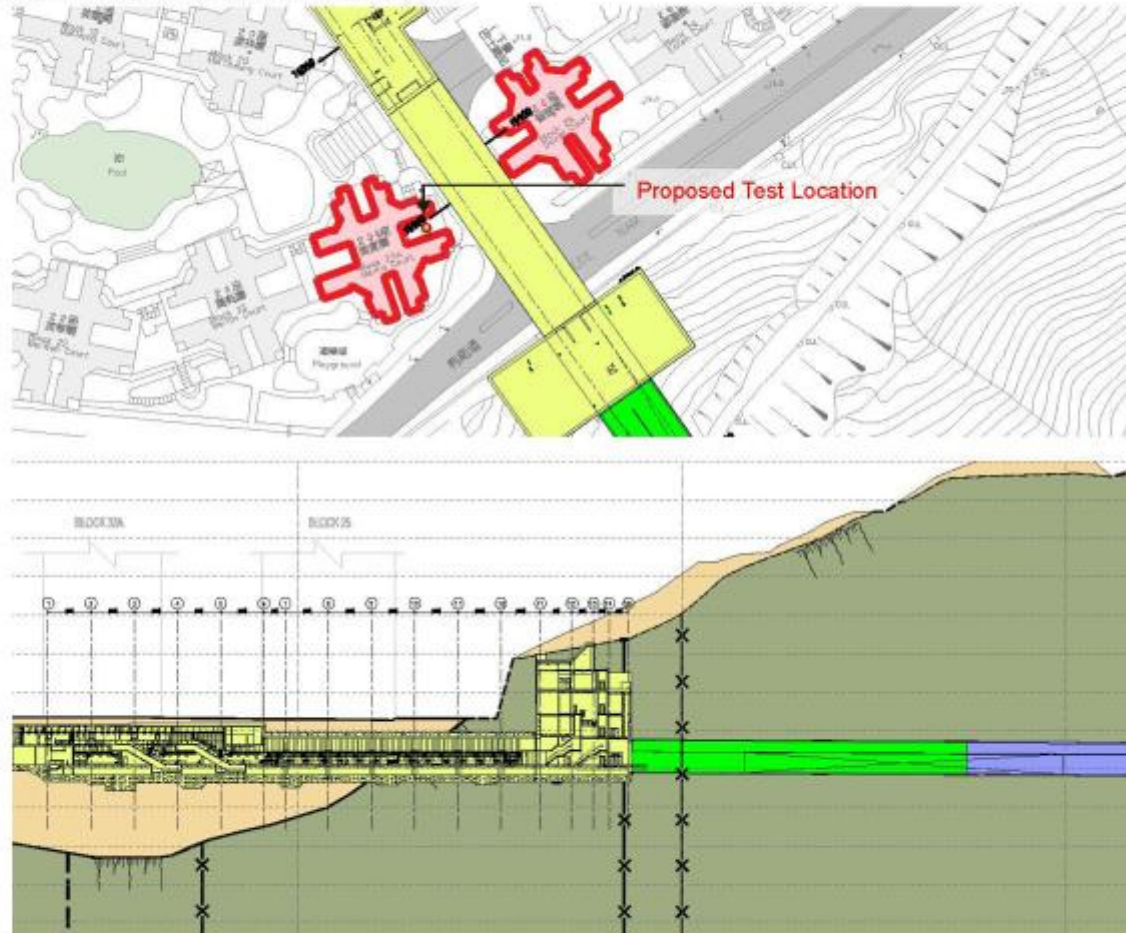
Proposed Test Location at Lobby for SOH6 Test
